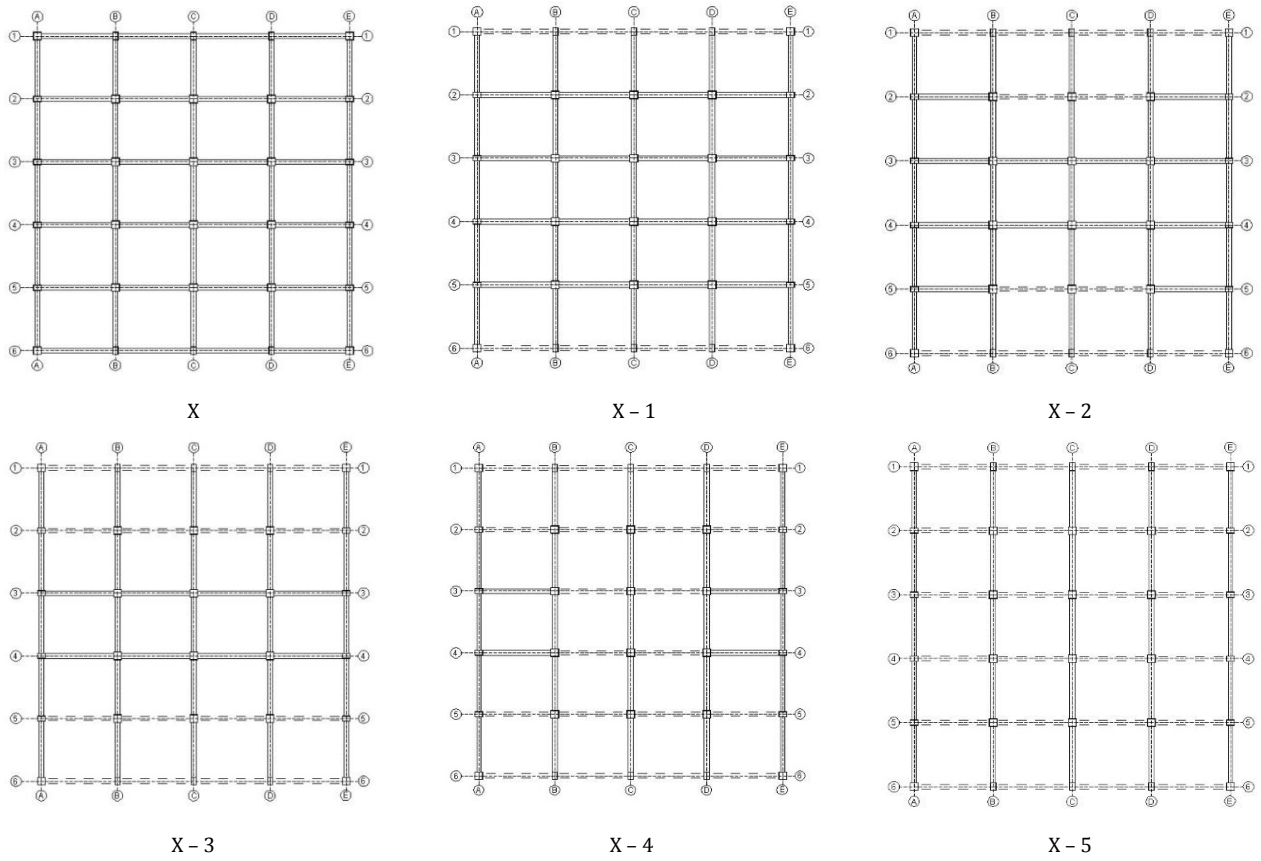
The case of infill walls in all of the building frames (plan image x-x).
